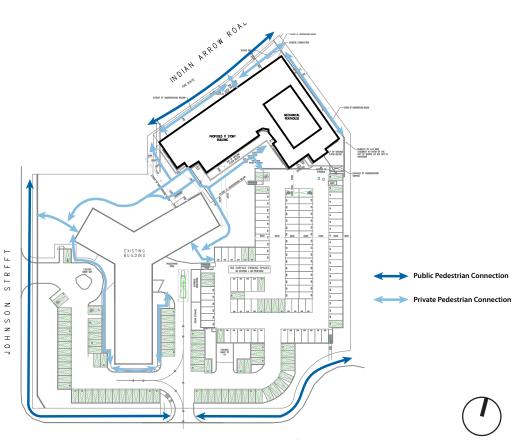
Proposed pedestrian circulation diagram on. Site plan by architectureunfolded.
